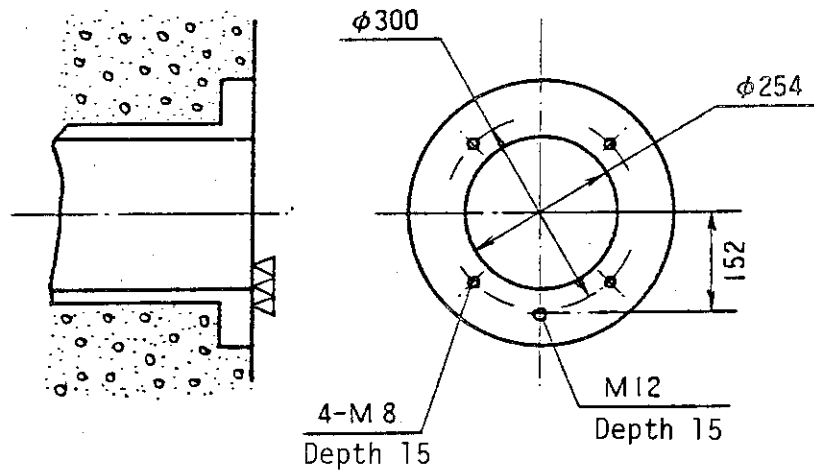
Through-wall hole for the type A 100 manipulator insertion
